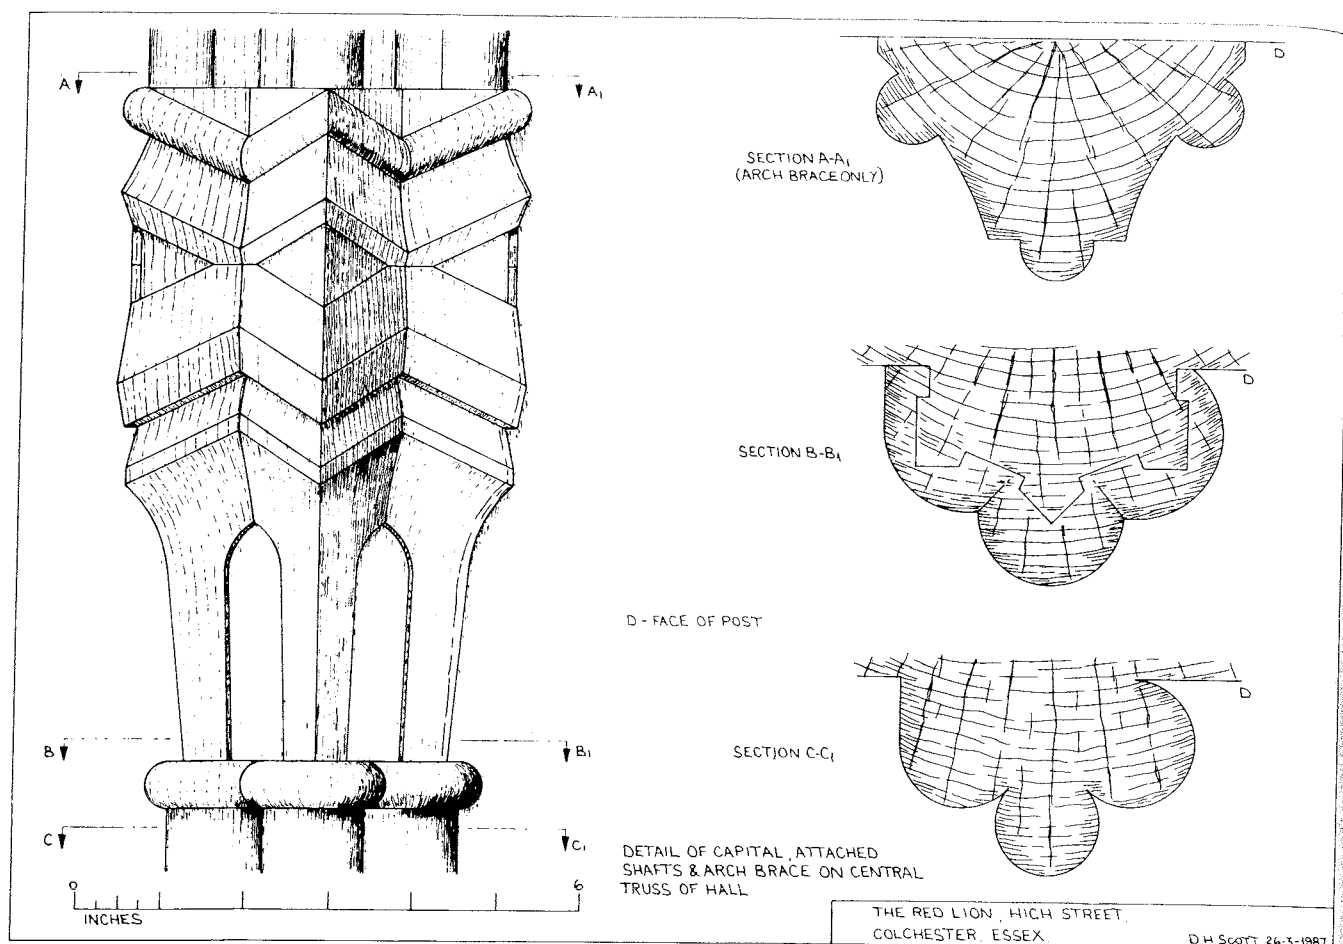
The Red Lion, Colchester. Detail of capital, attached shafts and arch brace on central truss of hall.
